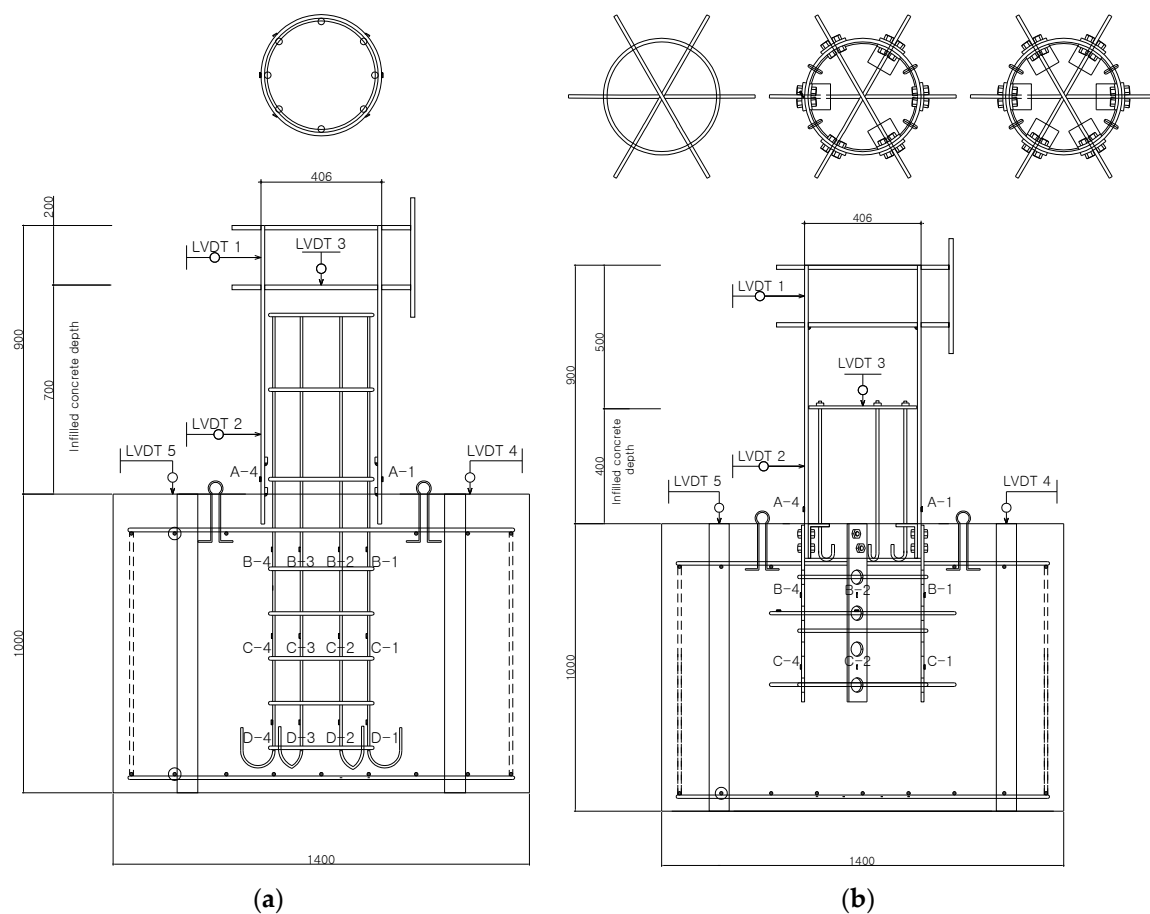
Details of test specimens. (a) Specimen strengthened with conventional steel rebars; (b) Specimen strengthened with perfbond shear connectors (unit: mm).
